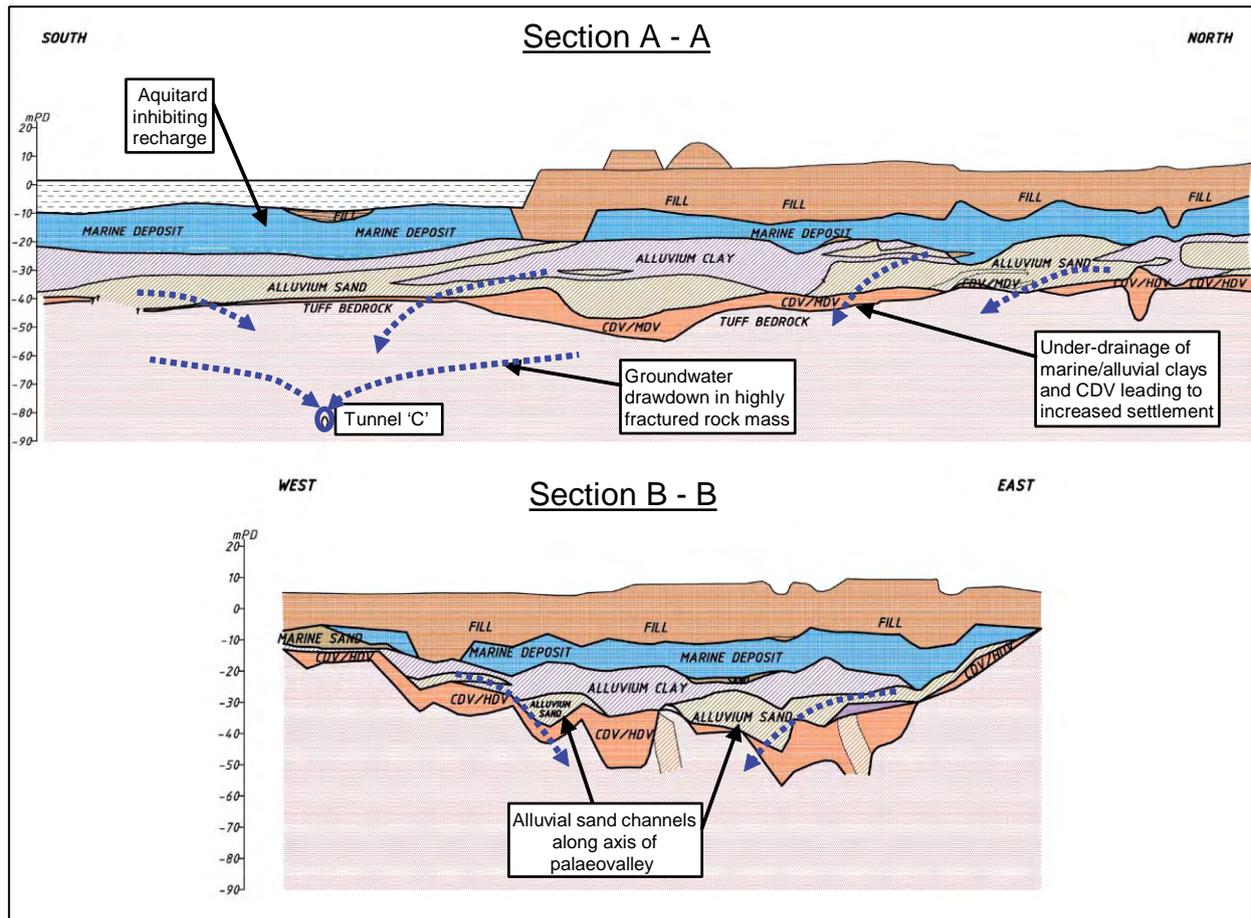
Geological sections showing inferred mechanism of reclamation under-drainage during tunnelling works (see Figure 6.7.18 for location of sections)
